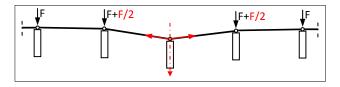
Example of purlin system acting as tie member in the case of failing main member (to be avoided)
